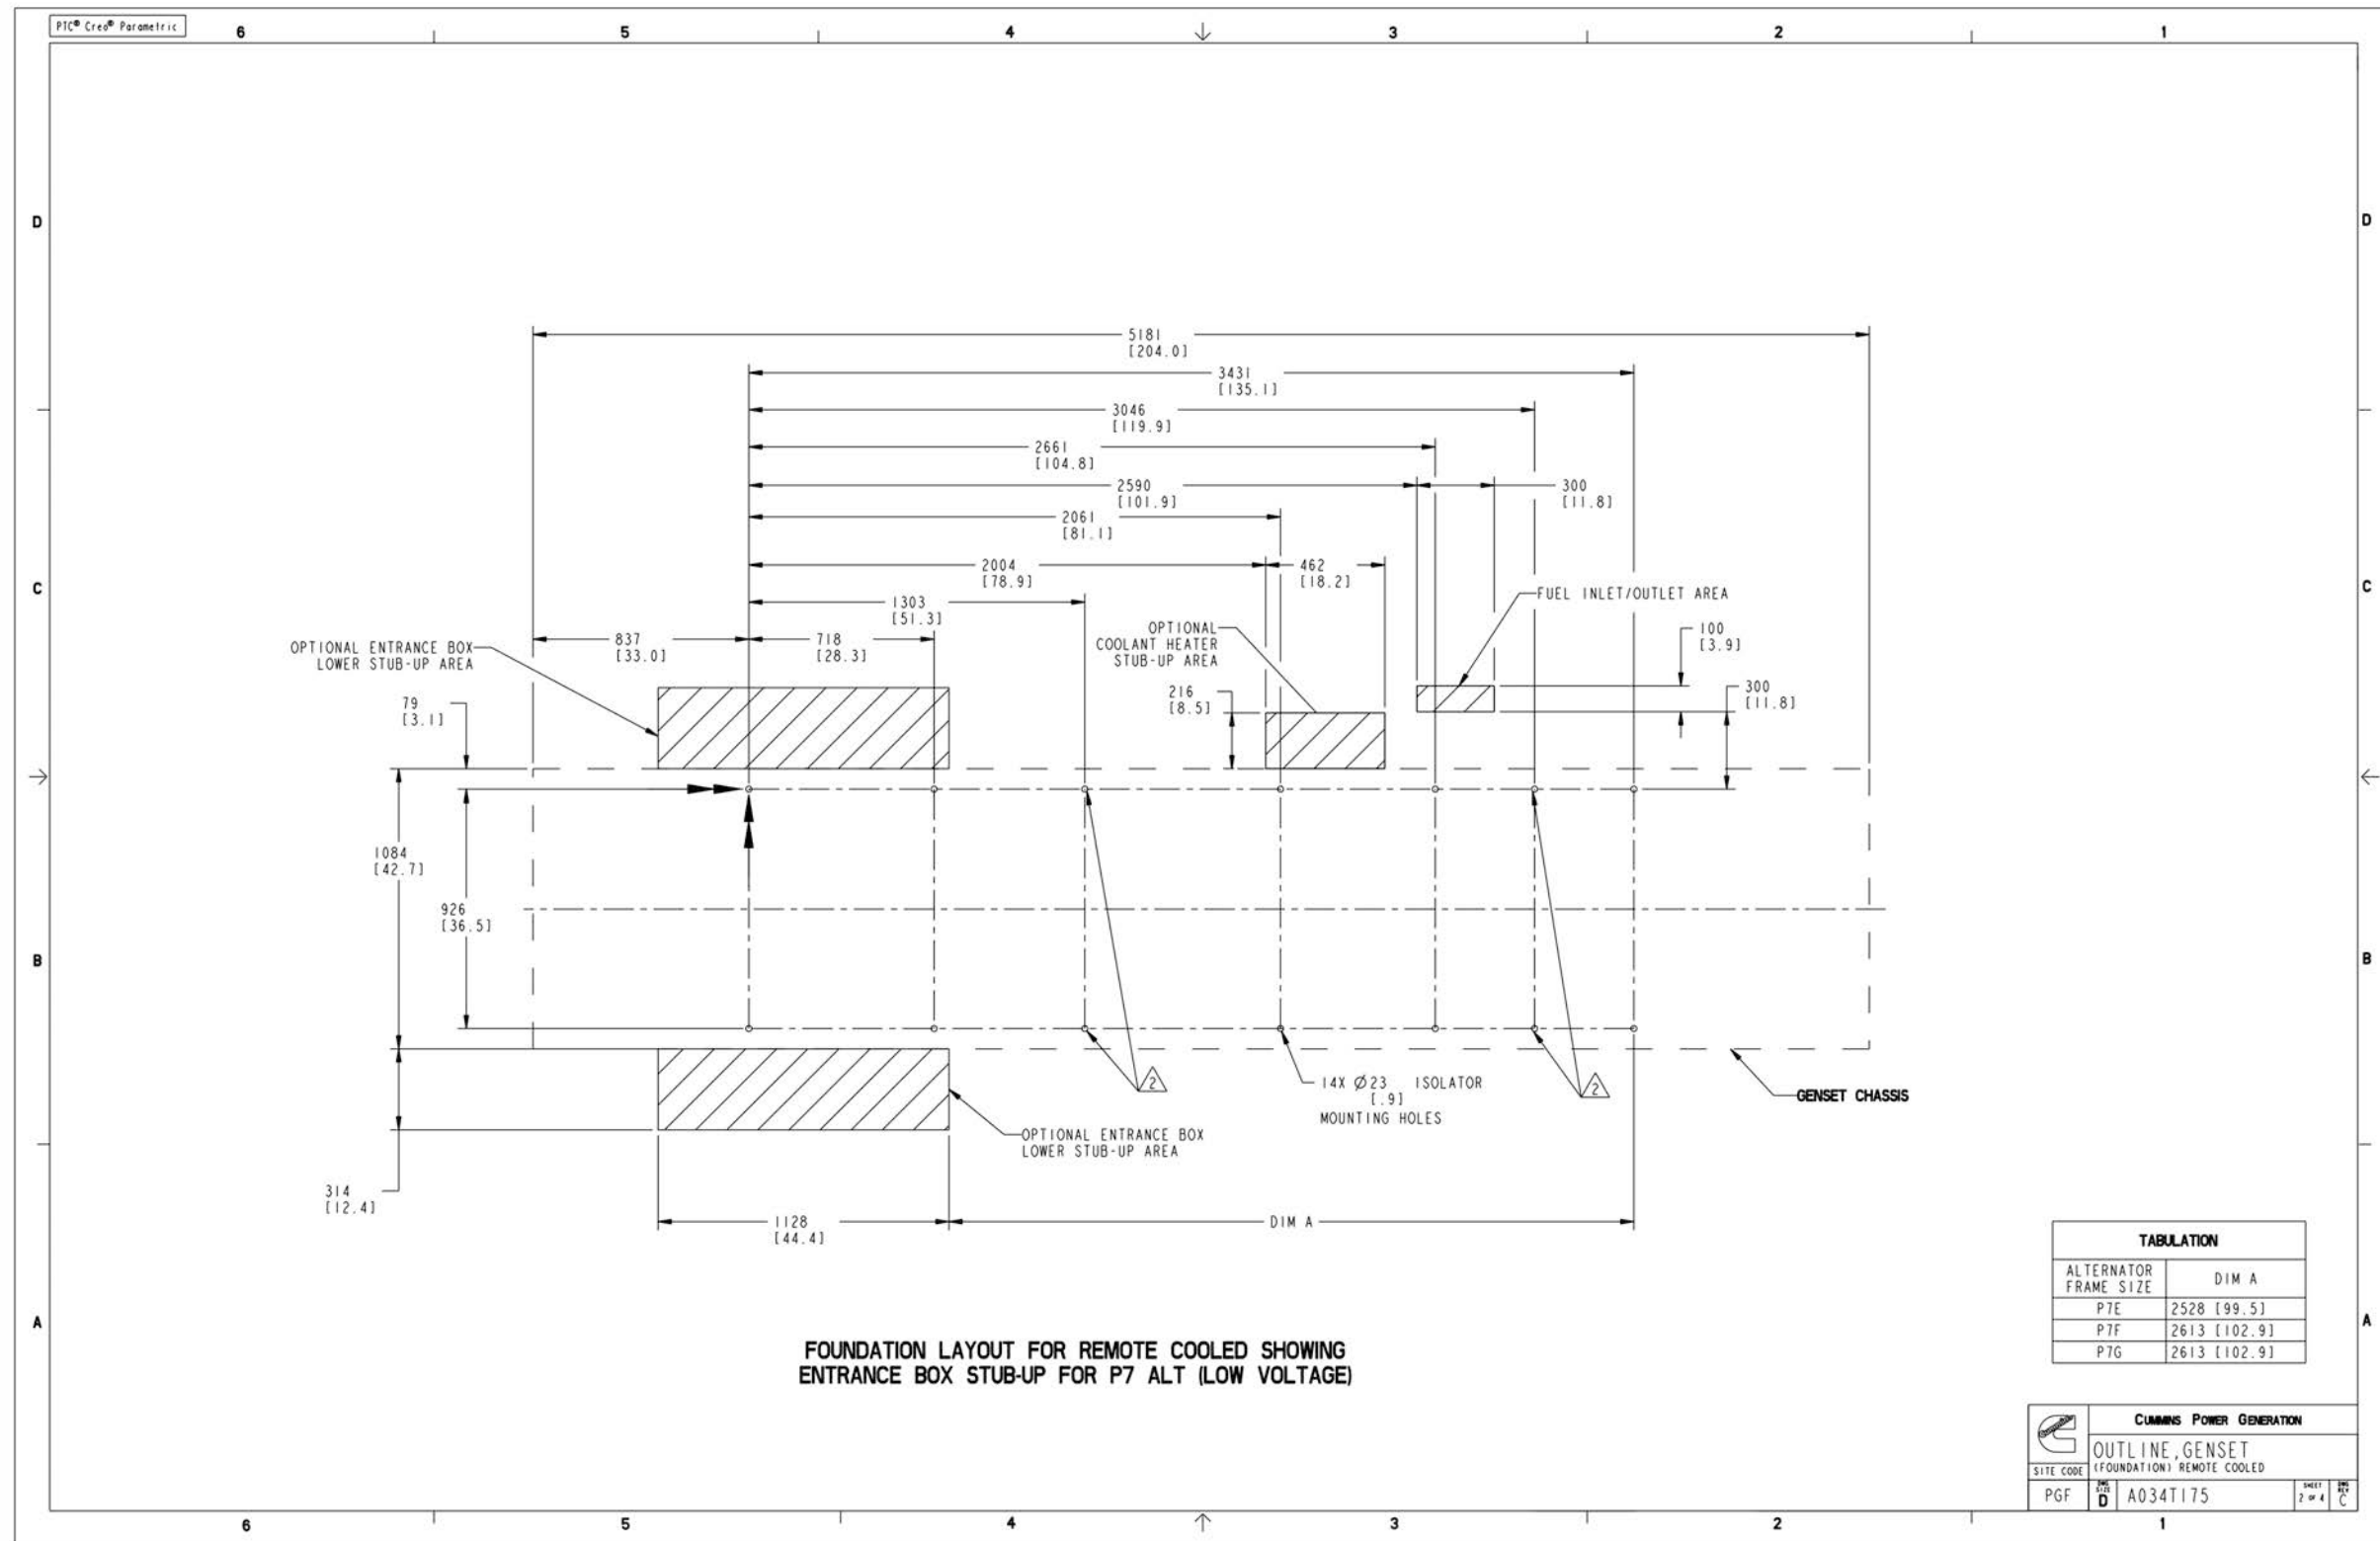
FOUNDATION DRAWING FOR REMOTE COOLED GENERATOR SET (SHEET 2)
